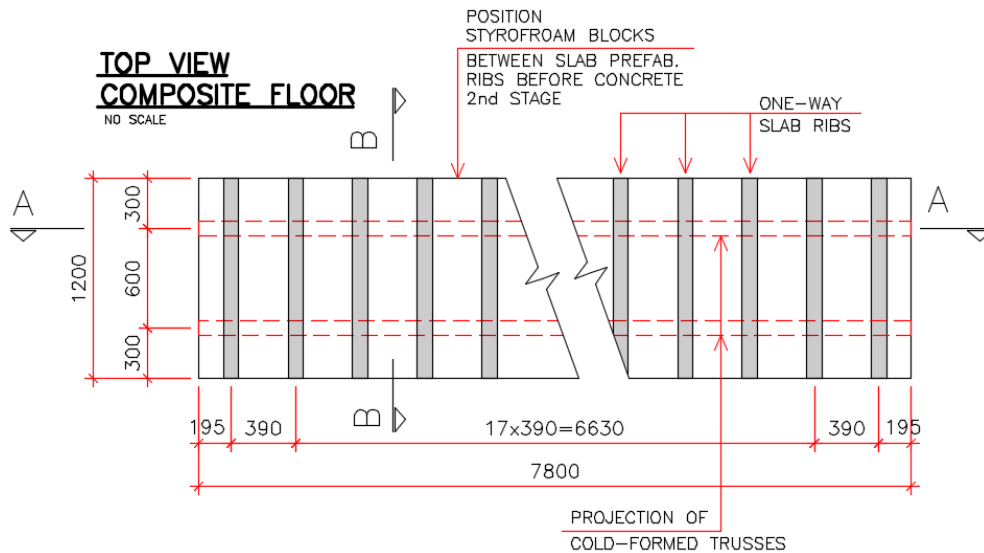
Top view of composite floor (expected full-scale test arrangement)
